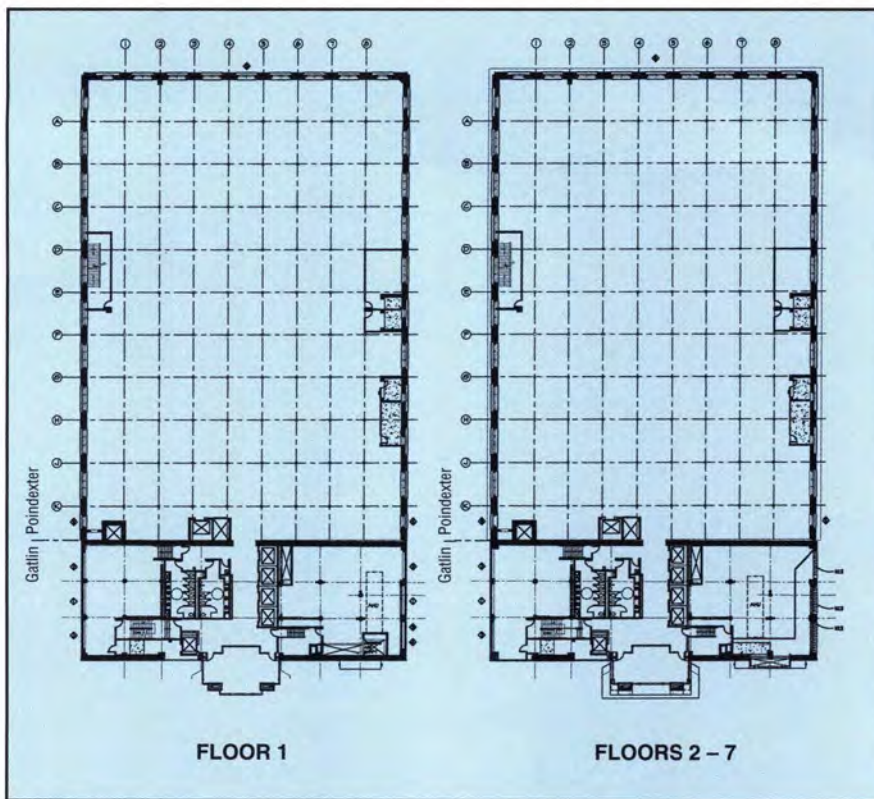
Original floor plans of Gatlin and Poindexter buildings.
